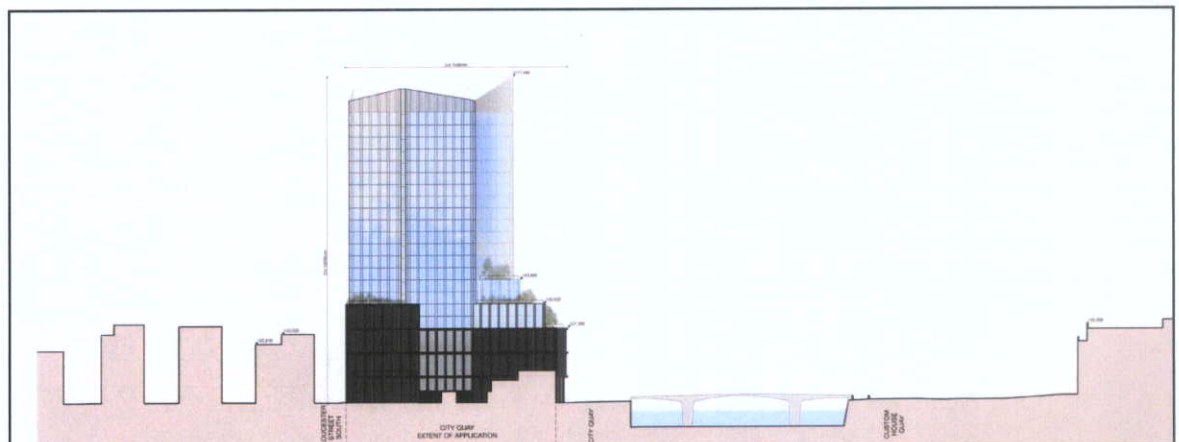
East Elevation (Mahoney Architecture 2022)
